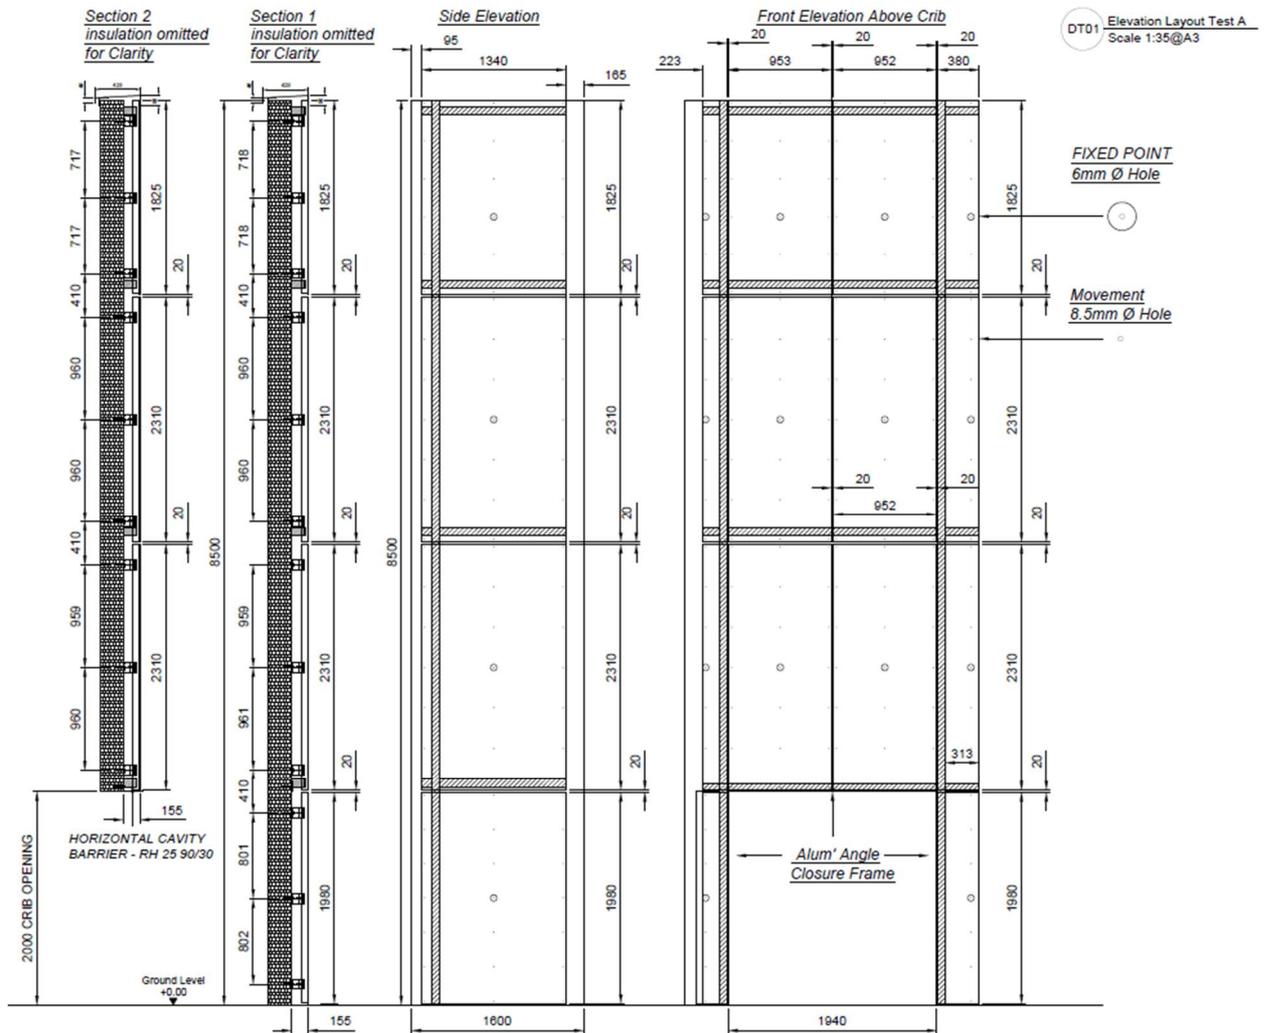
Front elevation, side elevation and vertical sections for the system (supplied by the Test Sponsor)
